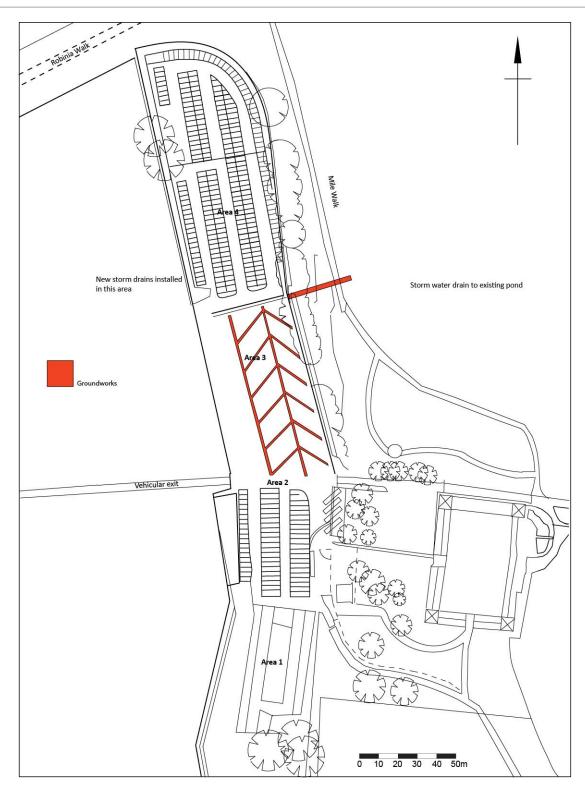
Plan showing location of ground works (based on plan supplied to BA by the National Trust)
